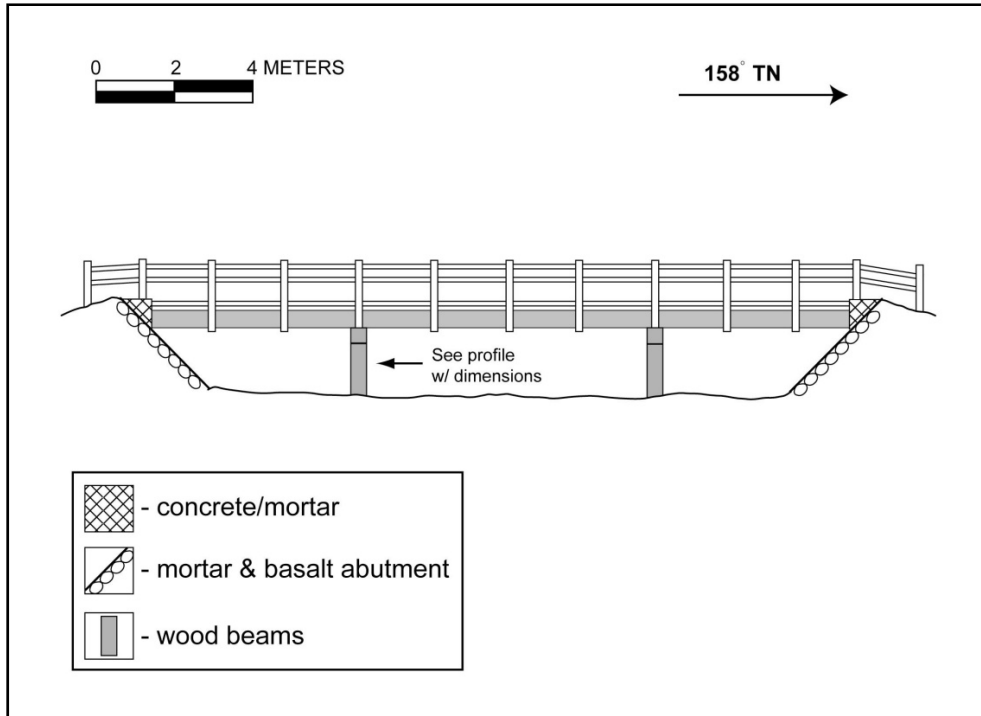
Elevation of SIHP # 50-80-07-6822 (Bridge 3)
